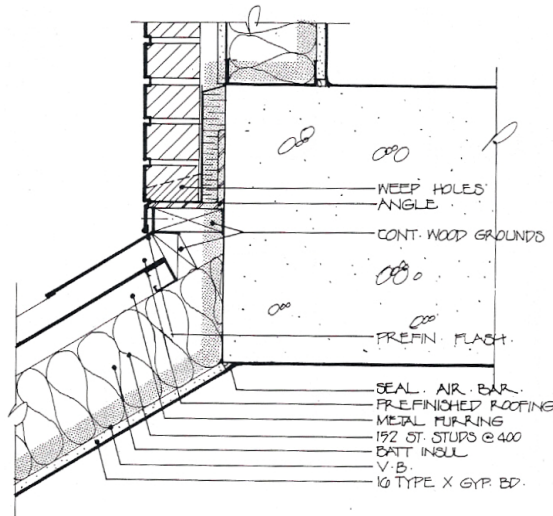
Sloped roof with 150 mm of insulation (dimensions are in mm) [3.1]
